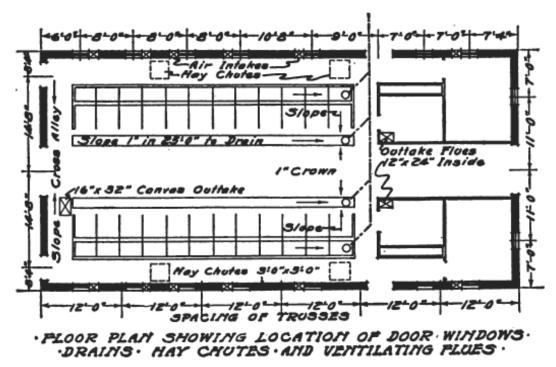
A floor plan of a dairy barn indicating location of hay chutes, ventilating flues, windows, etc.
